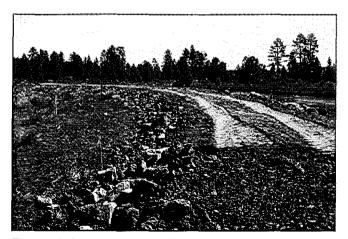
A permeable rock fill embankment under construction. Note placement of rock fill, separation fabric and embankment materials.
